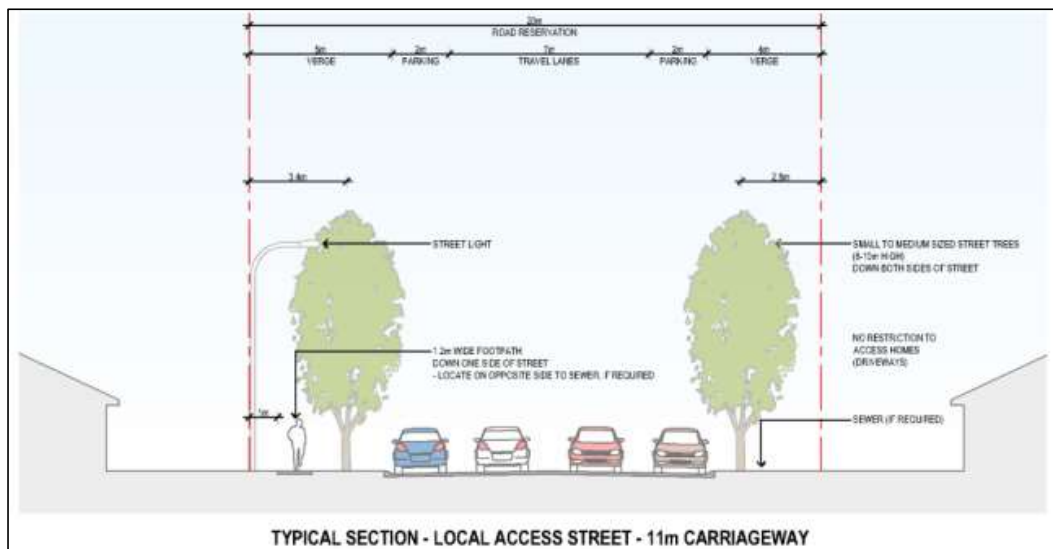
Typical Street Sections – Local Access Street (11m carriageway)
